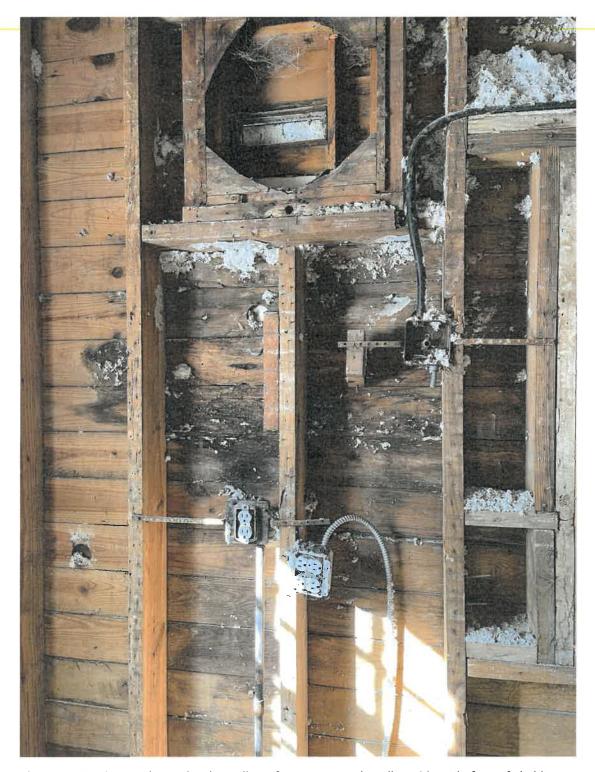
North Wing (First Floor) – Balloon framing at north wall, mold inside face of cladding
